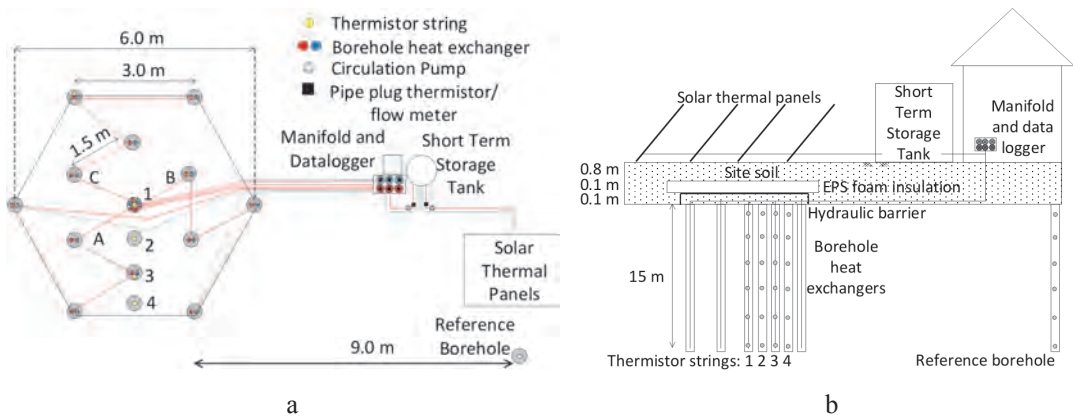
BTES system at UCSD (McCartney et al. 2017): (a) Plan view; (b) Elevation view
